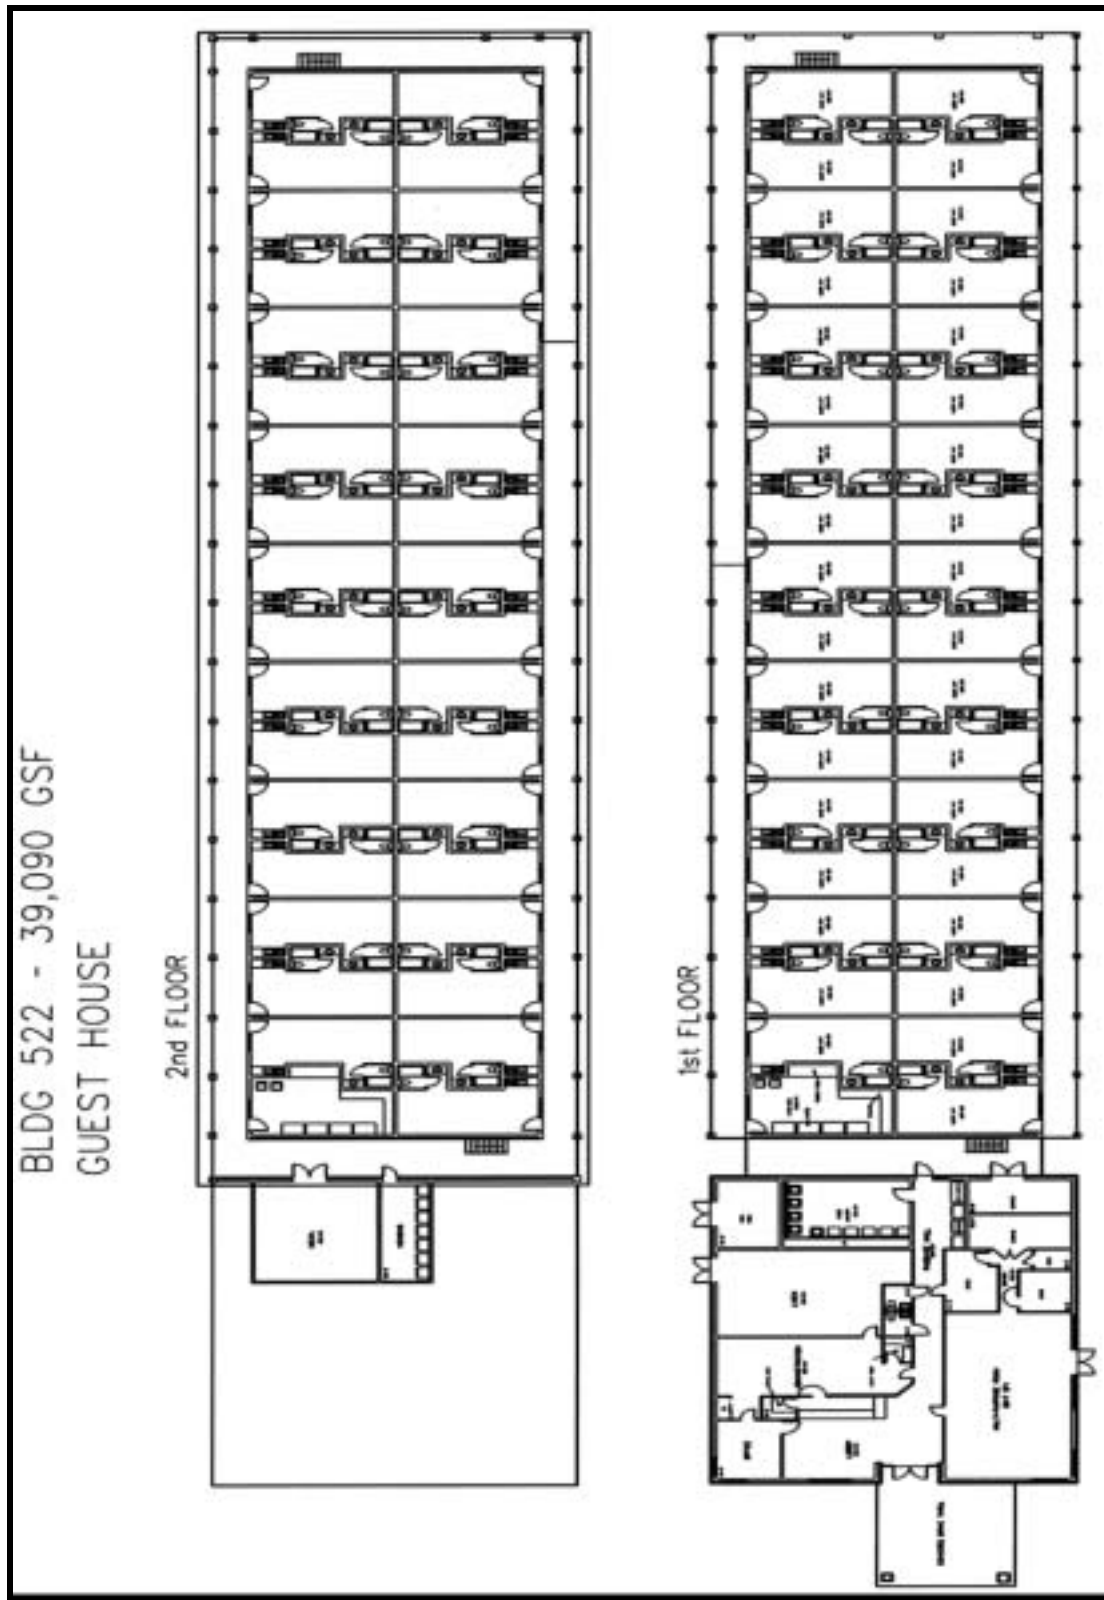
Transient quarter, Guest House, Bldg. 522, floor plan, Ft. Polk (ca. 1987) (Engineering, Ft. Polk).
